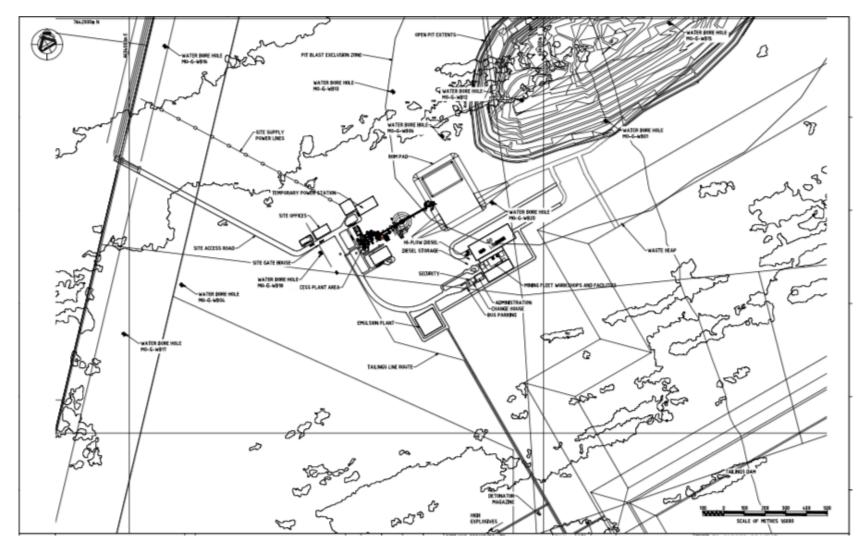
Layout of the mine site, including on-site infrastructure (Source: Knight Piesold, 2019)
